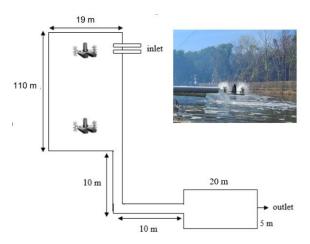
The top view layout and photo of the aerated wastewater stabilization pond
